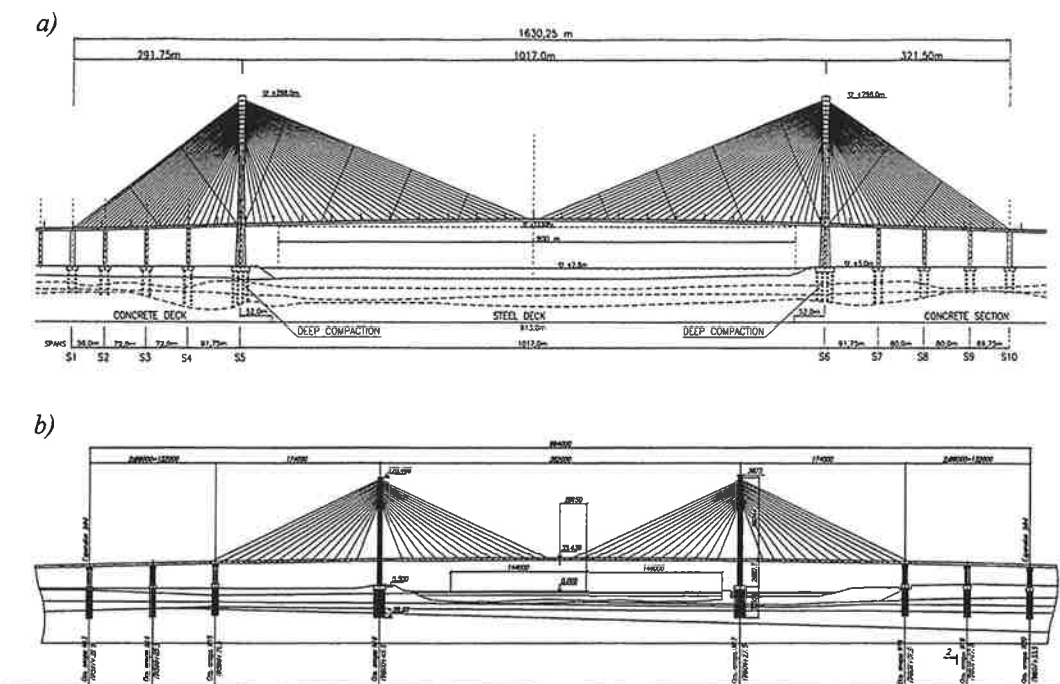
a) Elevation of the Stonecutters Bridge proposal and b) the Neva Cable-Stayed Bridge.
